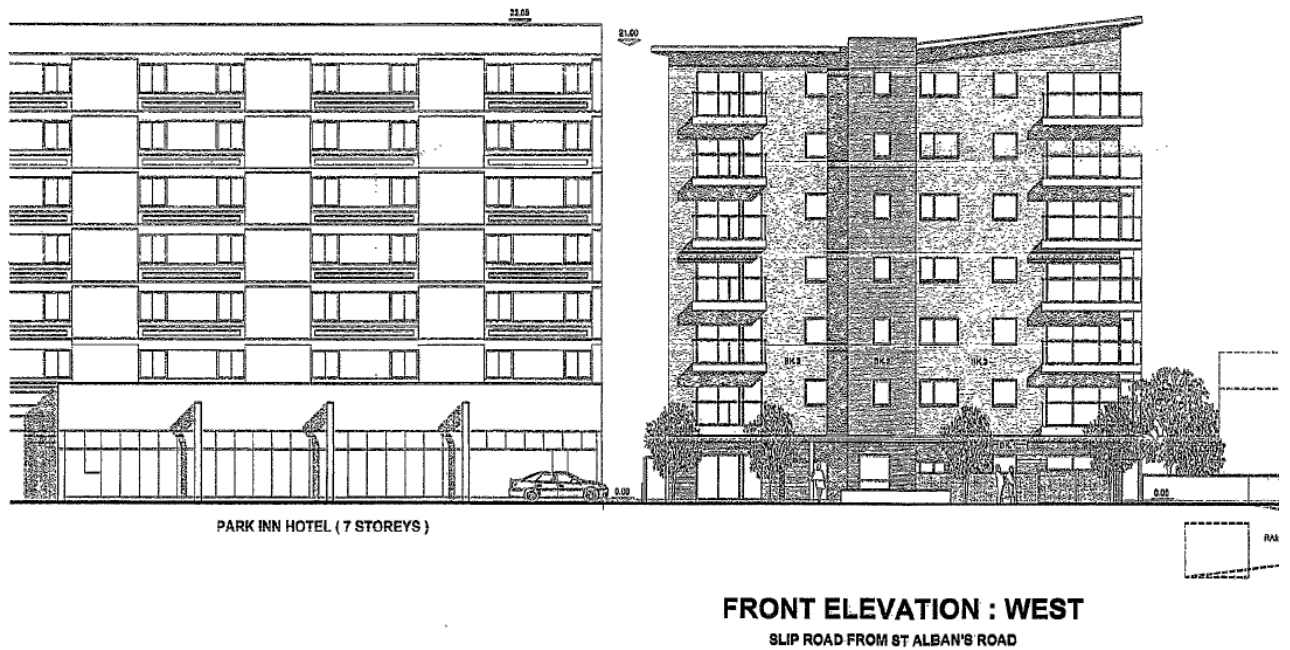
Approved front elevation drawing for planning application 13/00069/FULM.
